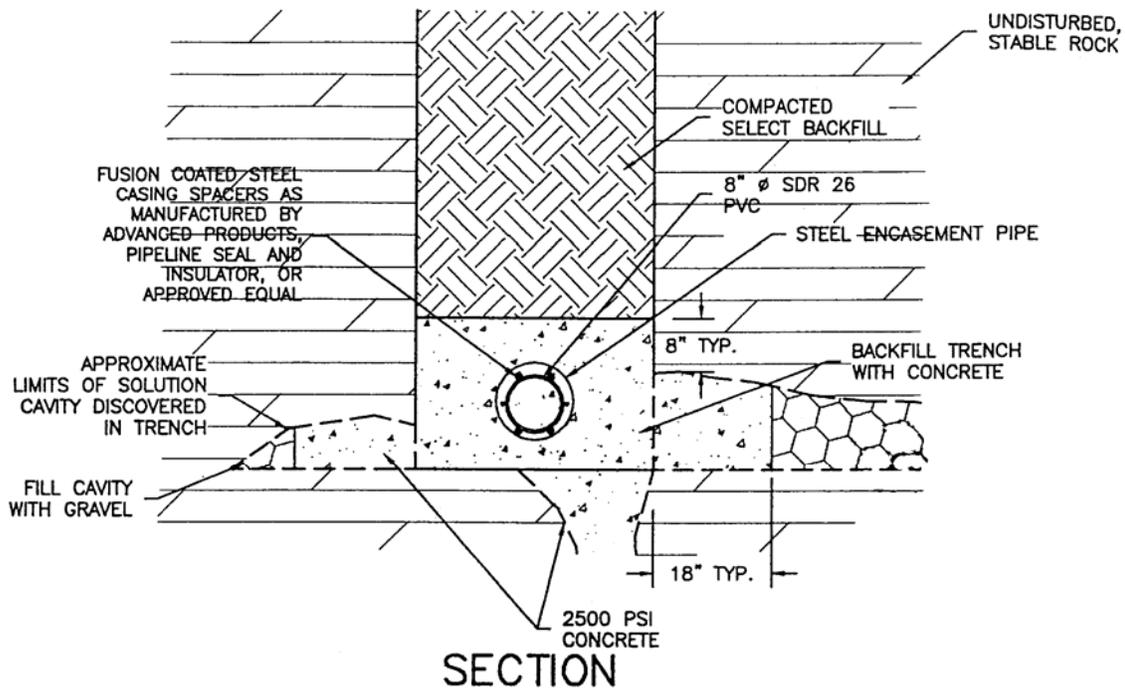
Utility Pipe Encased in External Steel Pipe (courtesy of Kathryn Woodlee)
